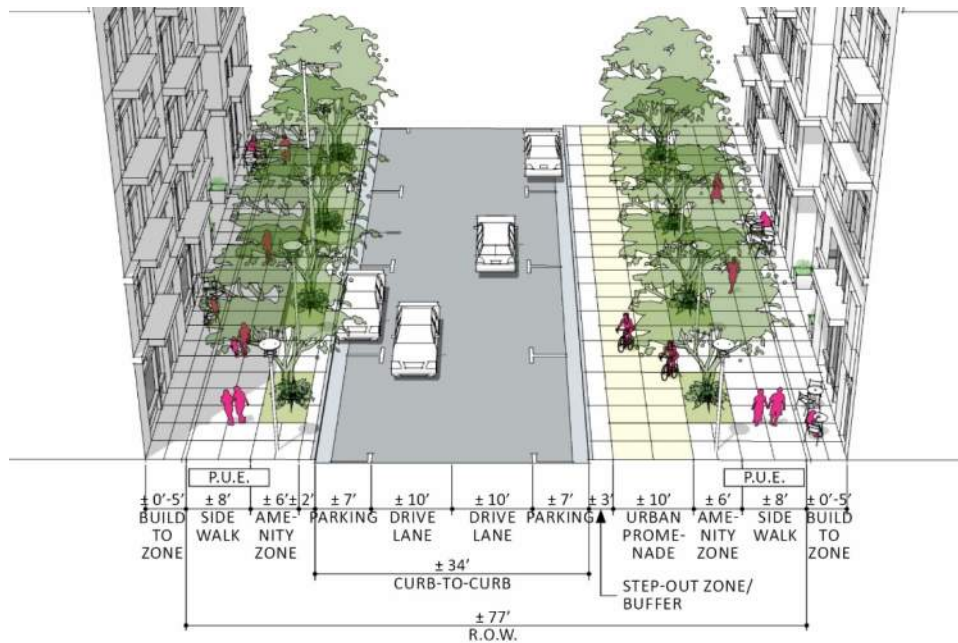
Urban Promenade Street adjacent to Commercial Ground Floor Use
